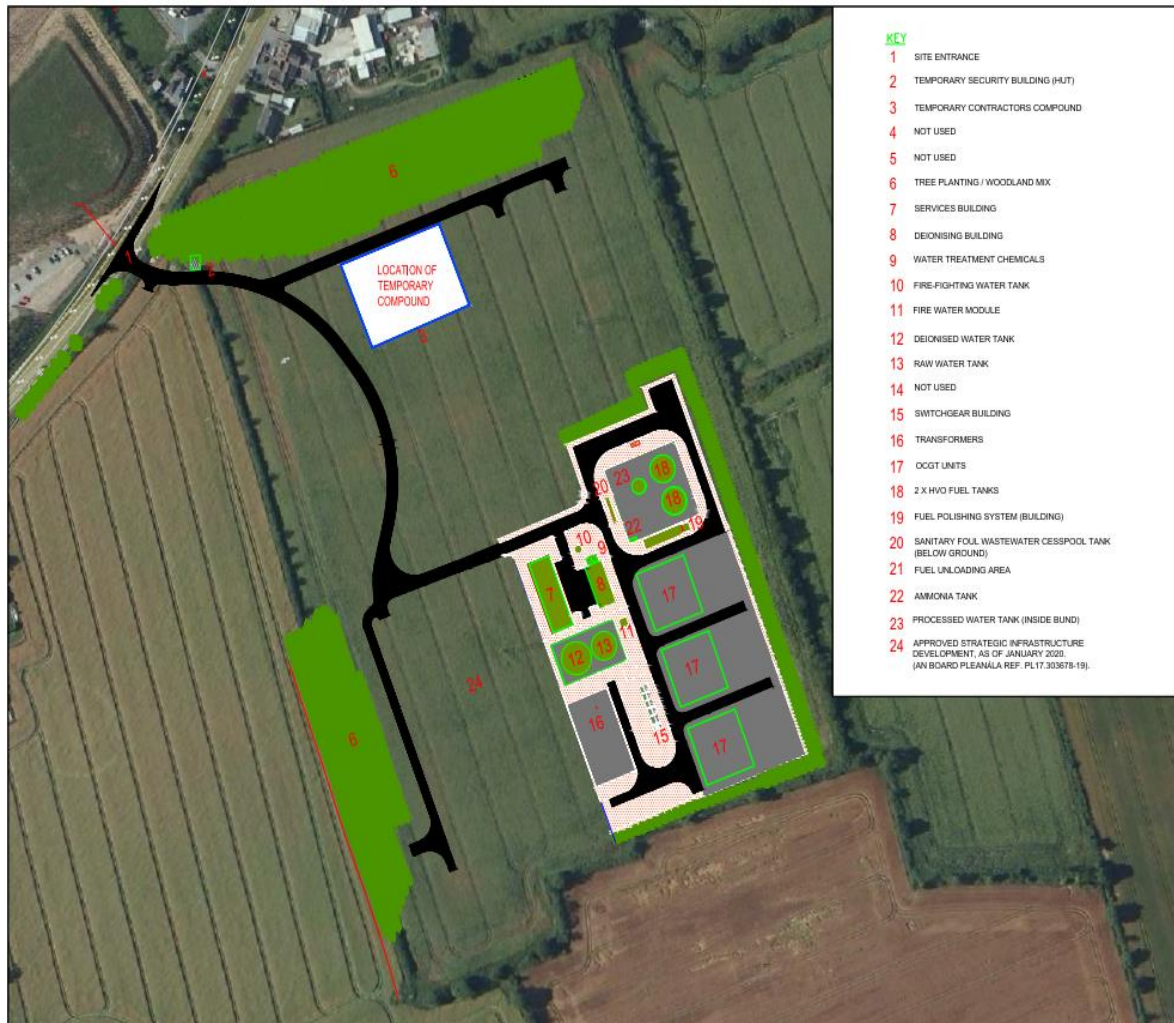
Site Key Overlay Plan of the Proposed Development (see drawing no. 695232-PTN-DR-009).
